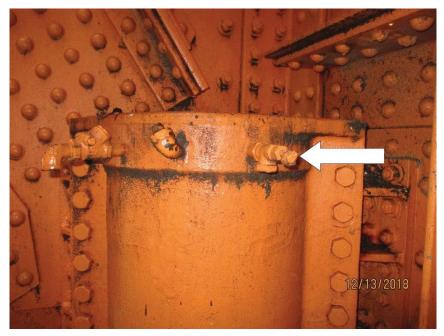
NW Span Air Buffer. The exhaust valve handle (arrow) is broken.
